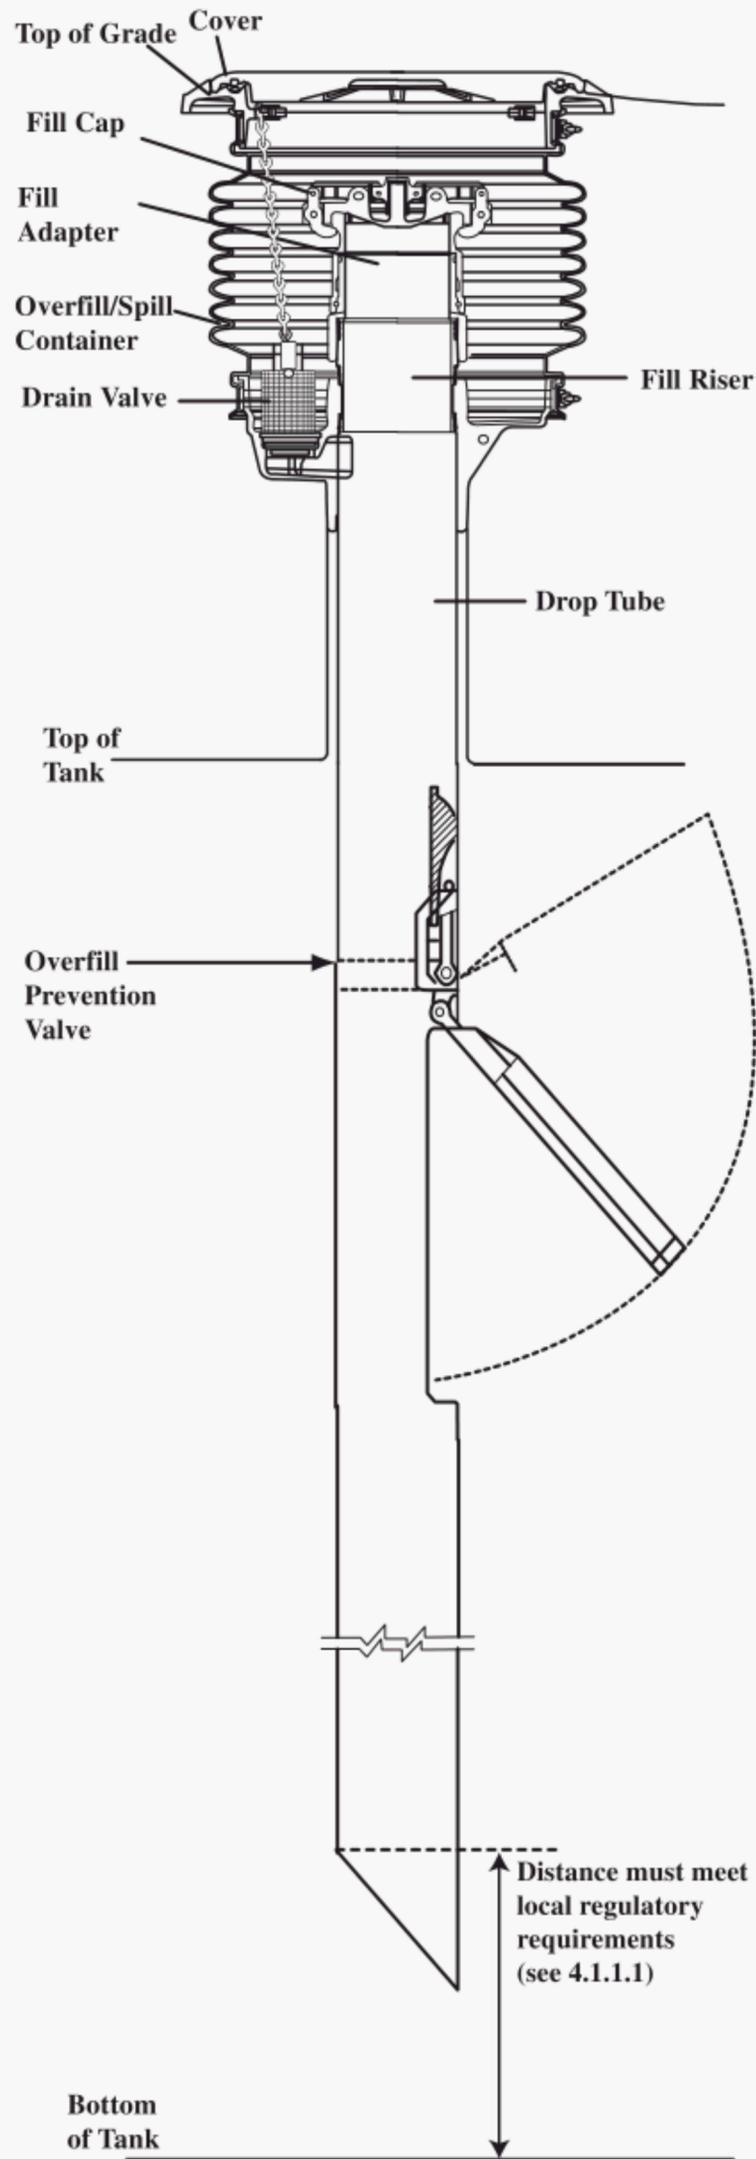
Typical Detail of Fill Pipe with Overfill Prevention Valve and Drop Tube (Dual System)
